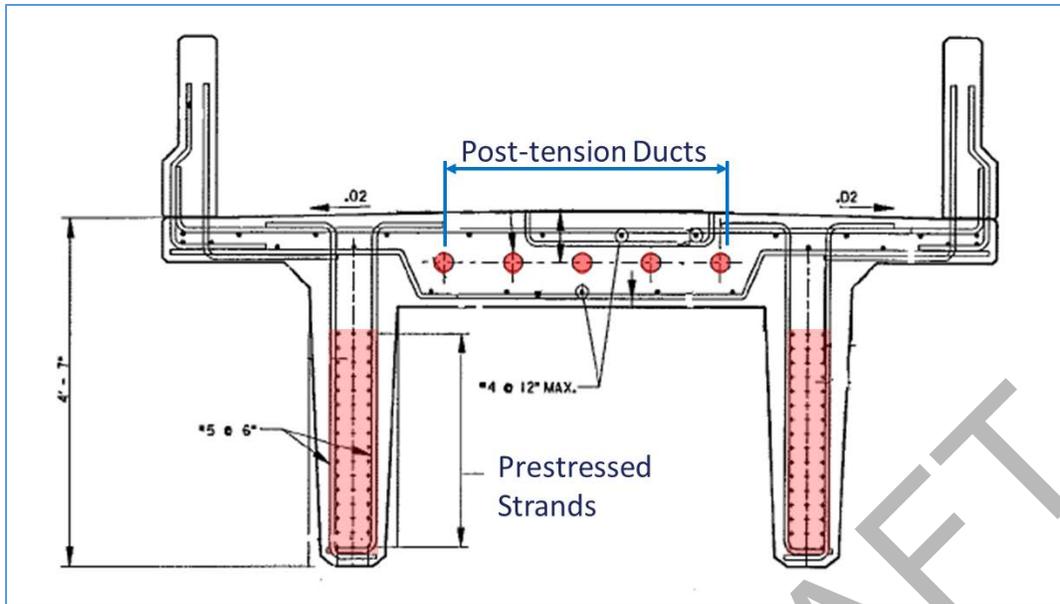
PRESTRESSED AND POST-TENSIONED DETAIL
